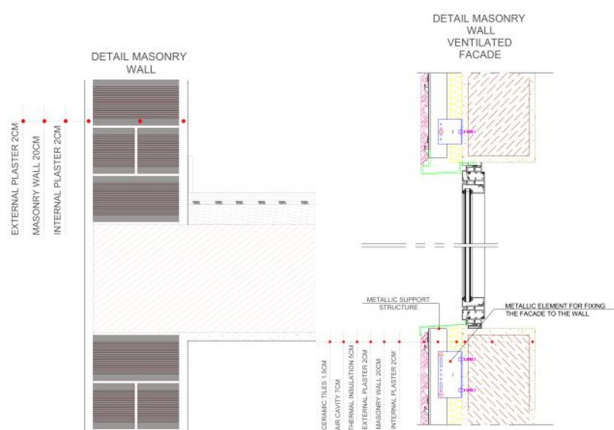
A. Standard masonry wall composition without ventilated facade; B. Masonry wall with a ventilated facade. (Source: POLIS University).
